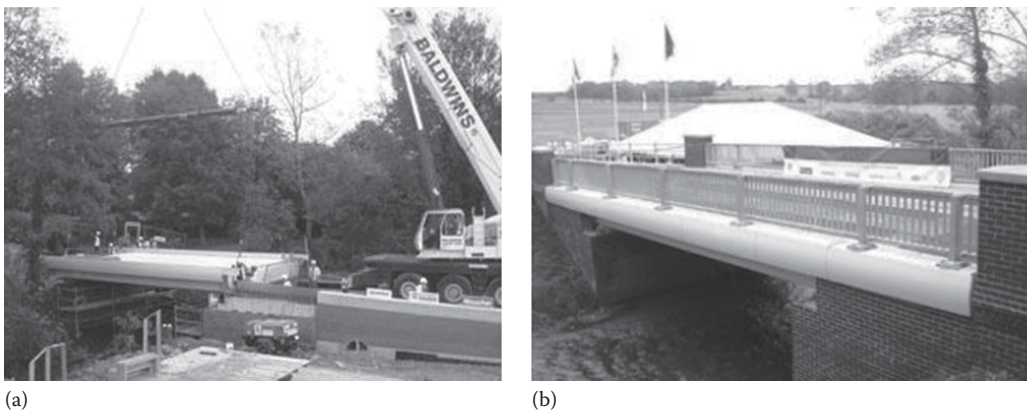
Lifting of West Mill Bridge deck (a) into position and (b) completed bridge. (Courtesy of Mouchel Parkman, Woking, U.K.)
